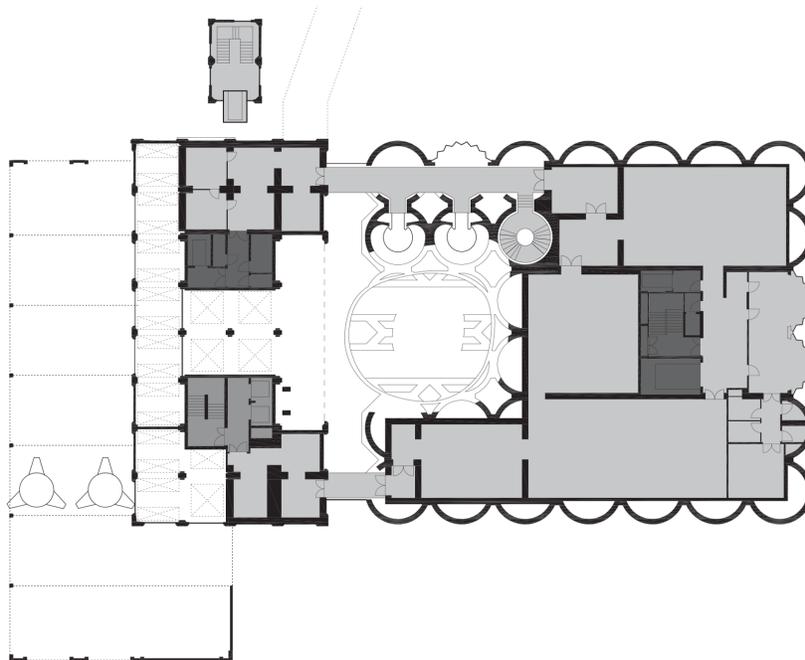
illustrating the ground floor plan of the museum building (Source: <https://www.dezeen.com>)
